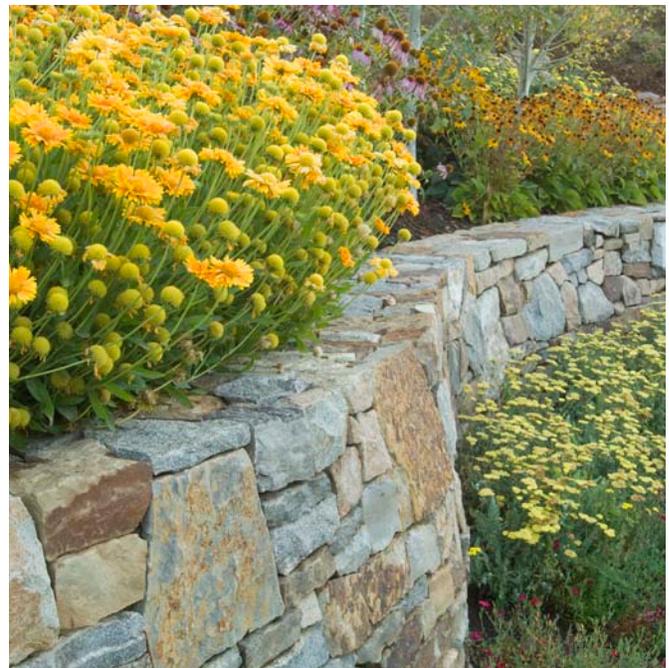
Walls shall be designed to blend in and complement building materials and colors. Curving wall layouts and incorporating landscape materials will help soften the contrast of the wall's vertical face.
